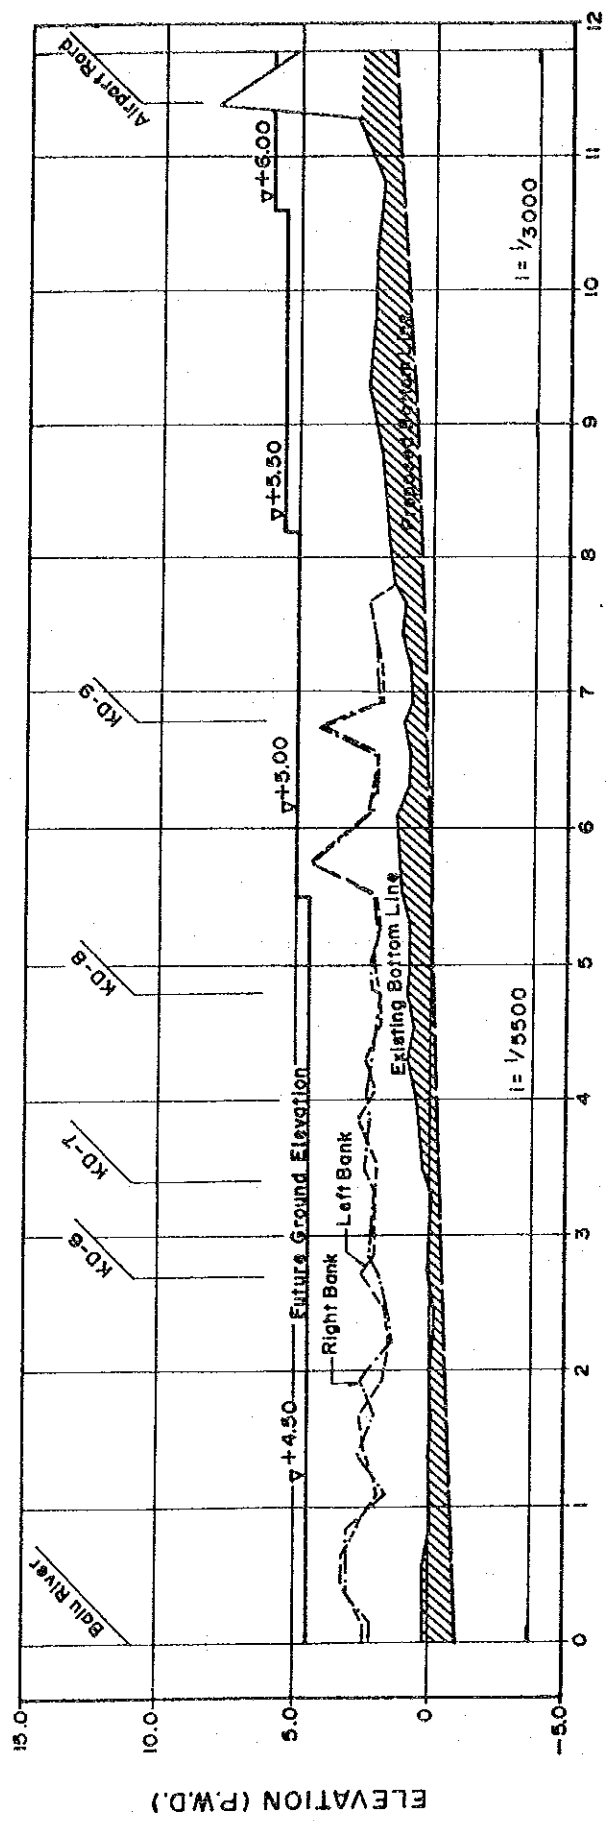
(1) PROPOSED LONGITUDINAL AND CROSS SECTIONS (KD-1)
